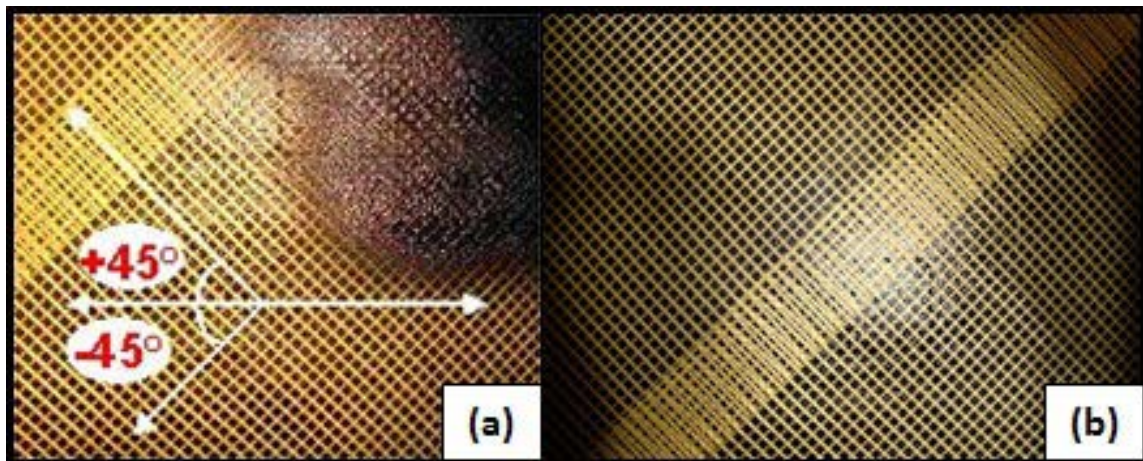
Fiber orientation. (a) Aramid fibers in fabric aligned ± 45 deg to horizontal mortar joint on CMU wall. (b) Successive pieces of fabric overlapped previous by approximately 8 in.
